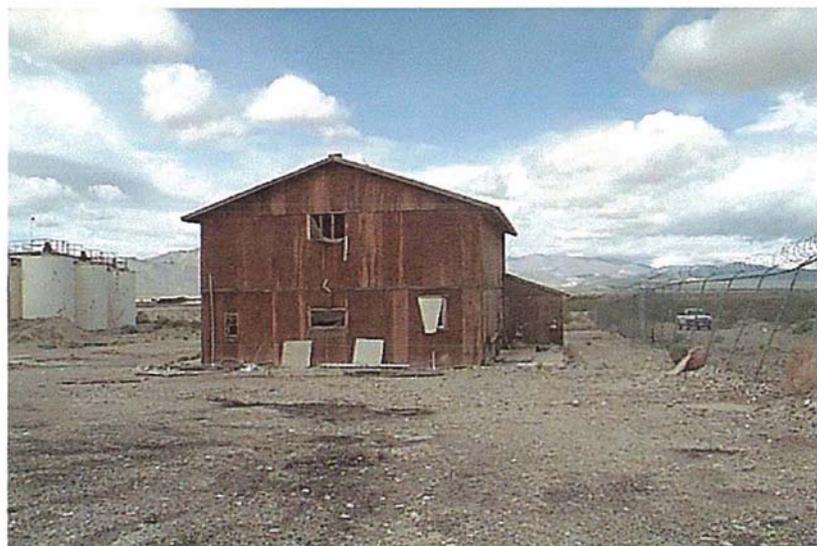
View to west showing the east side of the building in Figure 13. Windows have been broken-out. The north line of the fence that encloses the buildings and tank is at right.
